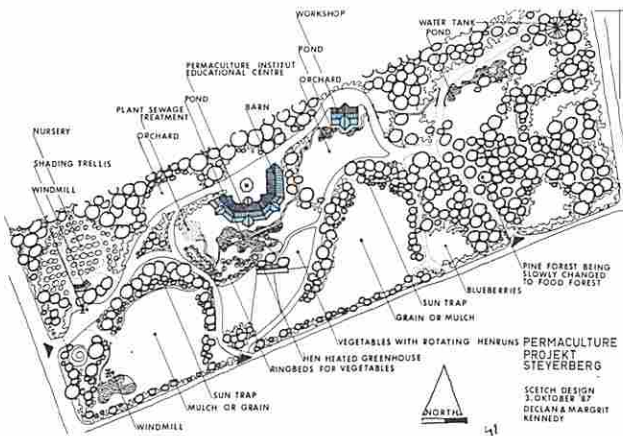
Site of the new building to be constructed as Phase 2 of the project
